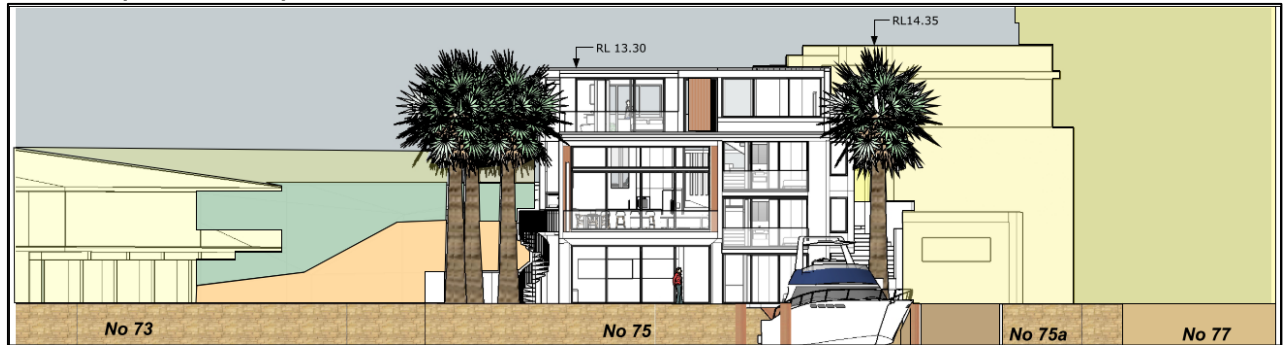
Rear elevation showing proposal in relation to adjoining properties
